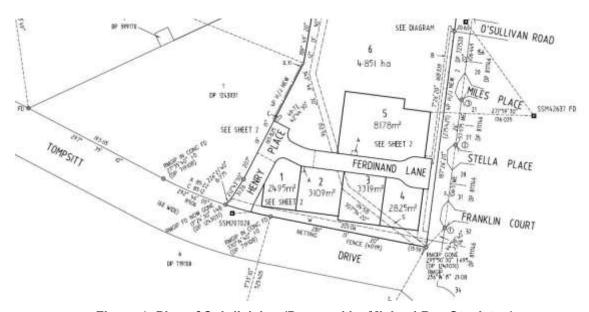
Plan of Subdivision (Prepared by Michael Roy Stapleton)
